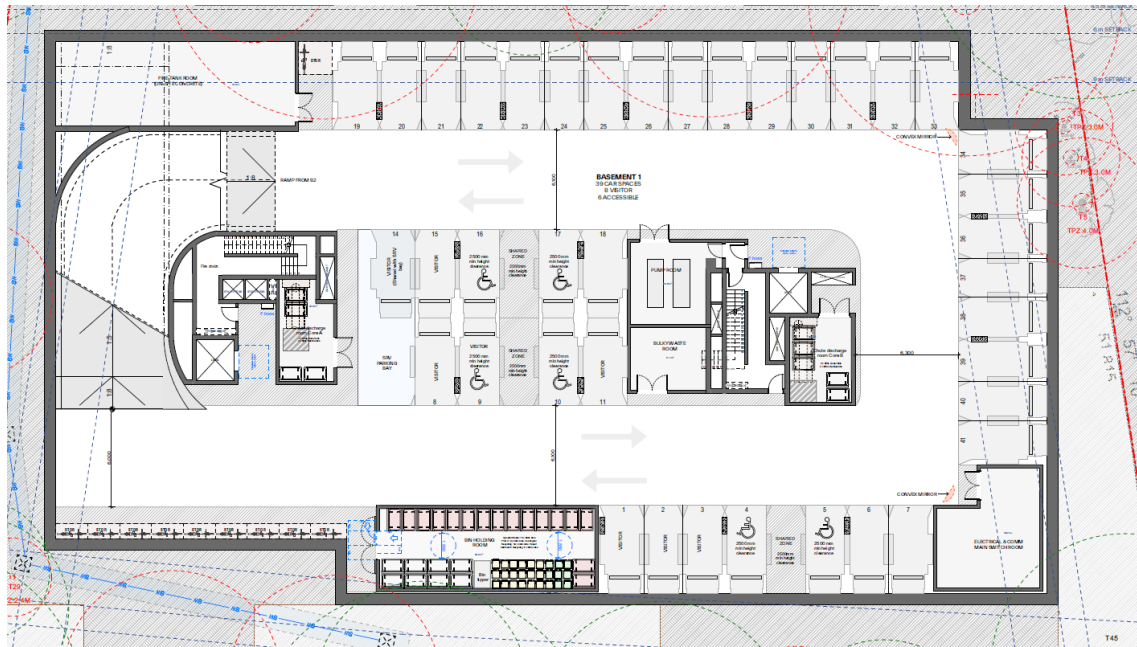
Basement 1 parking plan (Source: PBD Architects)
